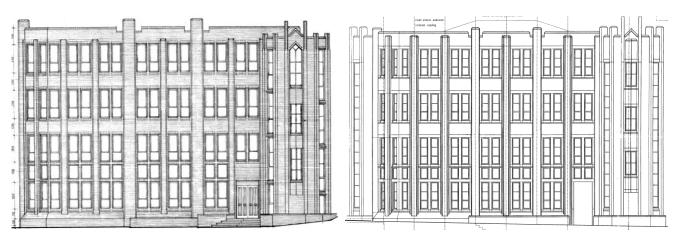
(left): Proposed north-east elevation of new library building, designed by Anthony Turrell Architects, Oct 1996. Figure 55 (right): Proposed north-east elevation of new library building, designed by Lewis Patten Architects, Dec 1997.
